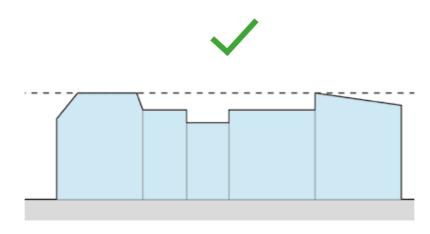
Diagrammatic elevation showing a mixture of pitch and mansard roofs
